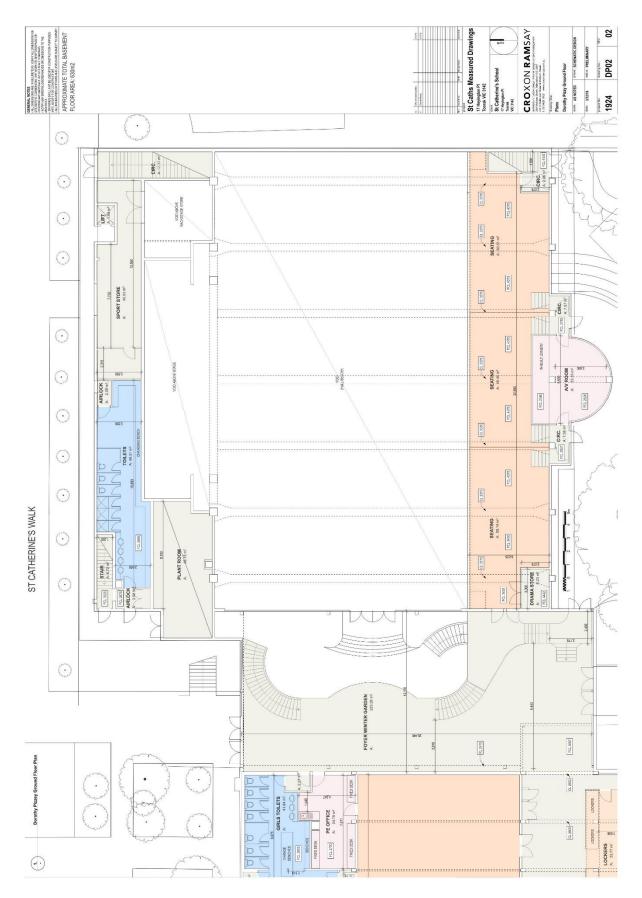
Dorothy Pizzey Centre – Ground Floor Plan
